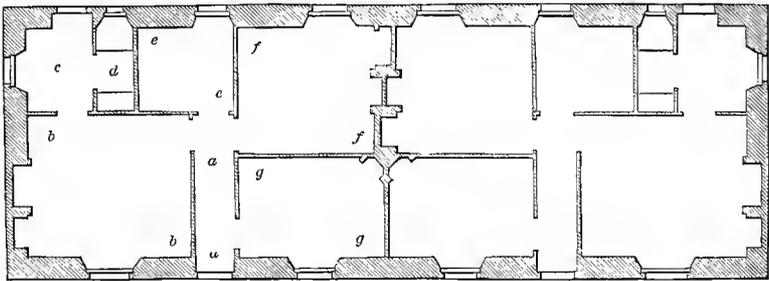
Alternative ground-plan to ground-plan in fig. 741.
